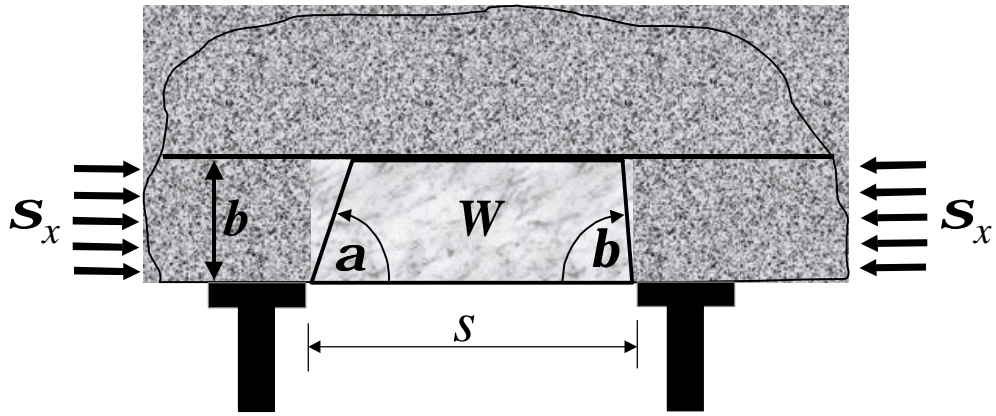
Rock mass instability due to shear failure at the abutments.
